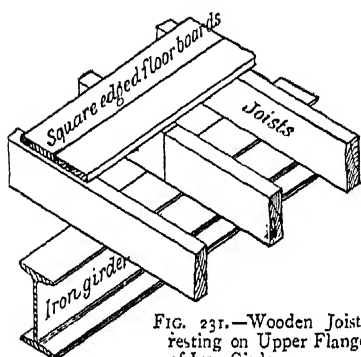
Wooden Joists resting on Upper Flange of Iron Girder.
